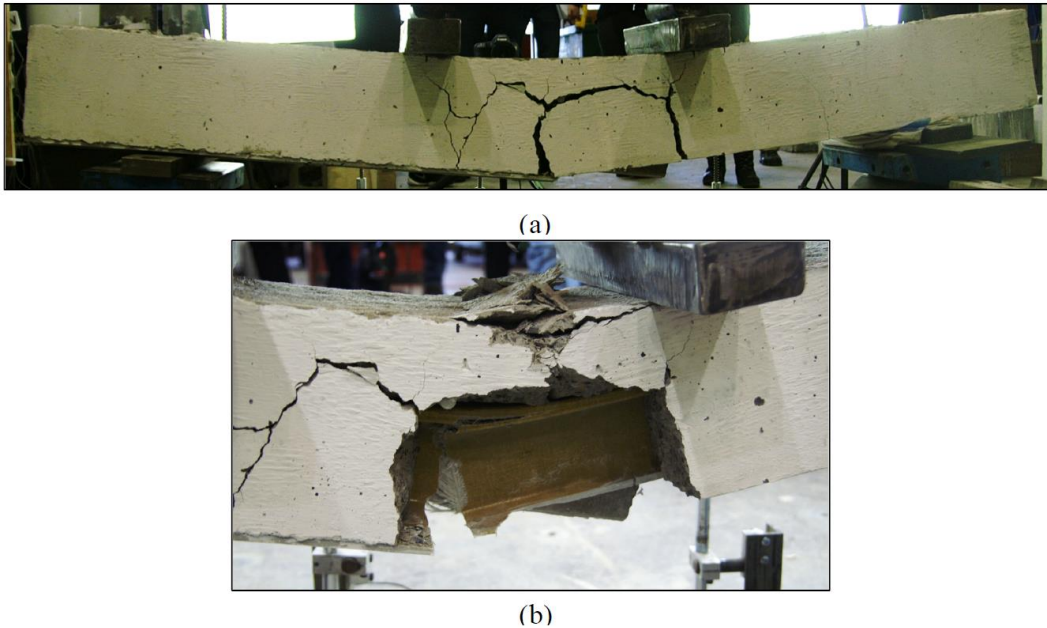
(a) Beam SD1 crack distribution (post-failure) and (b) GFRP web fracture at a damage boundary.
